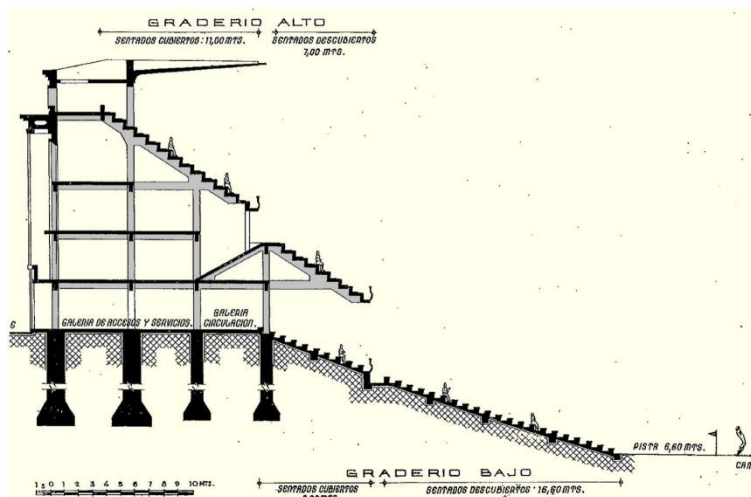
Typical cross-section on the west side of the original stadium (1944–1947). The upper canopy, with a 10-meter overhang, was never built
